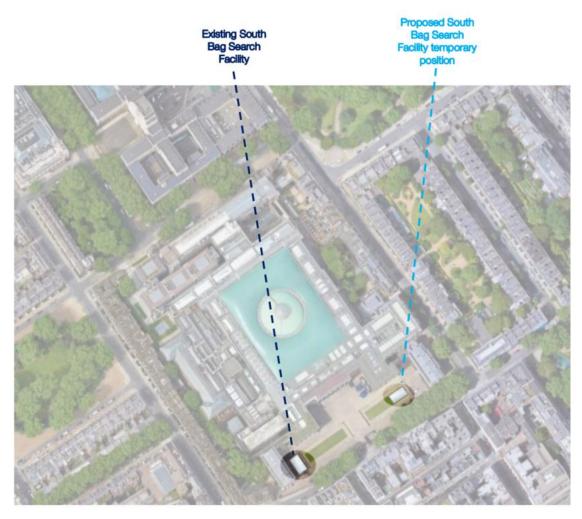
(above): Aerial plan visual of the existing security bag search facility and the proposed temporary security bag search facility
